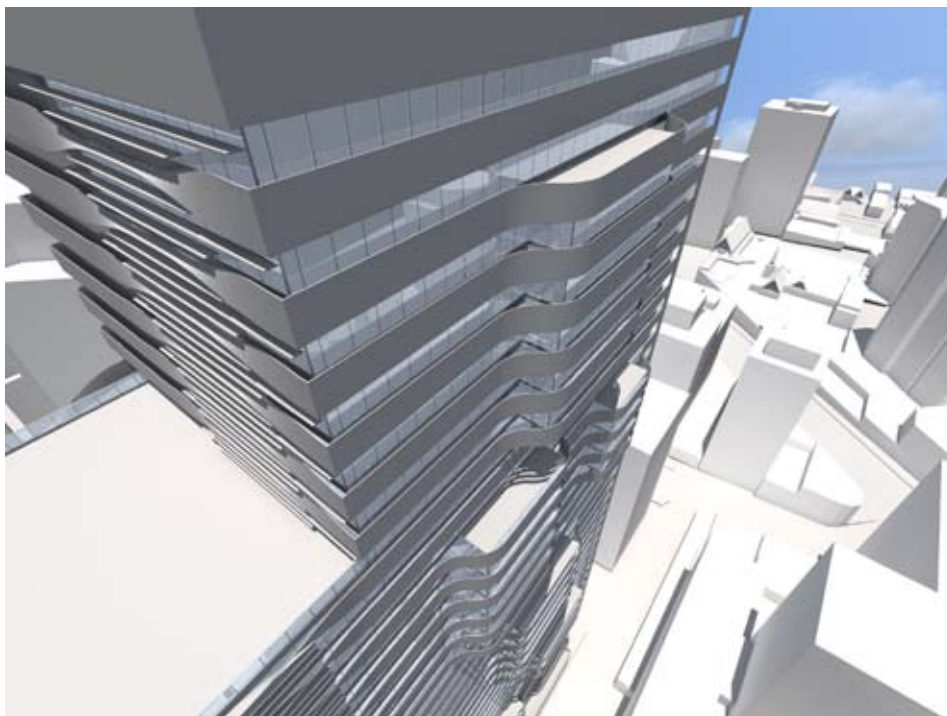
Shading wrapping around winter gardens to give visual interest to the façade
